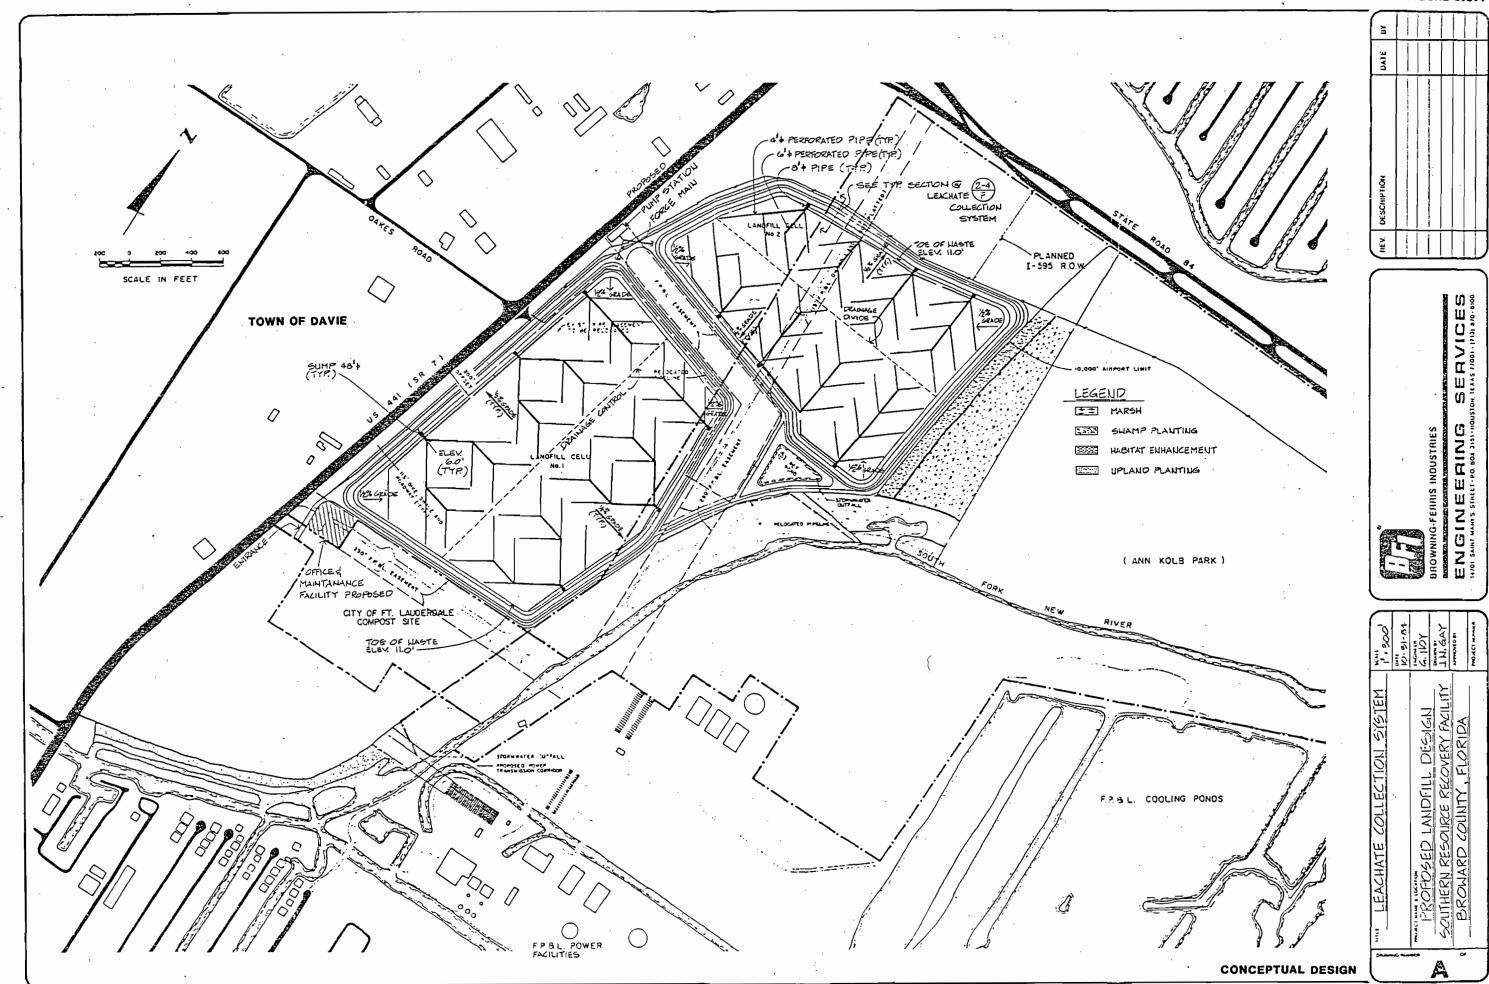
through 5.3.7, provide an illustrative example of the landfill plan and details. The discussion on landfill design presented below supercedes the information provided in the design drawings.
